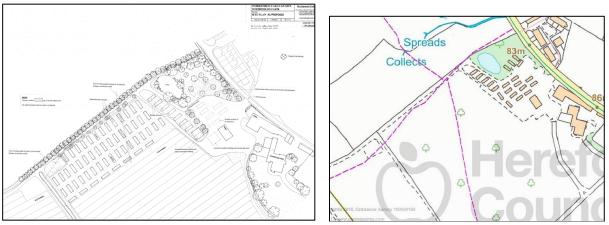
Current Proposed Site Plan and extract showing PROW (pink) for clarification
